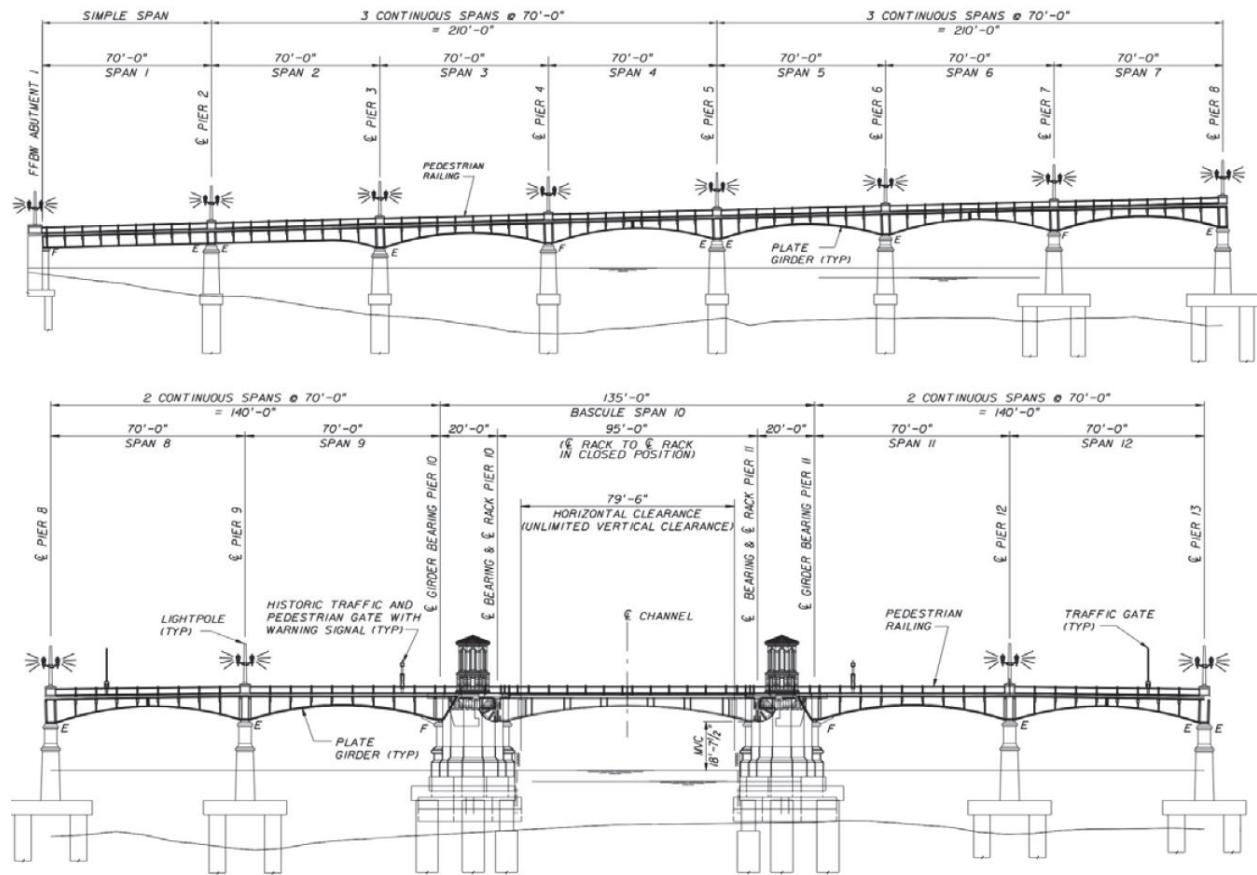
Plans from the inspection report noted as looking south which shows Pier 1 to be the east most end bent.
